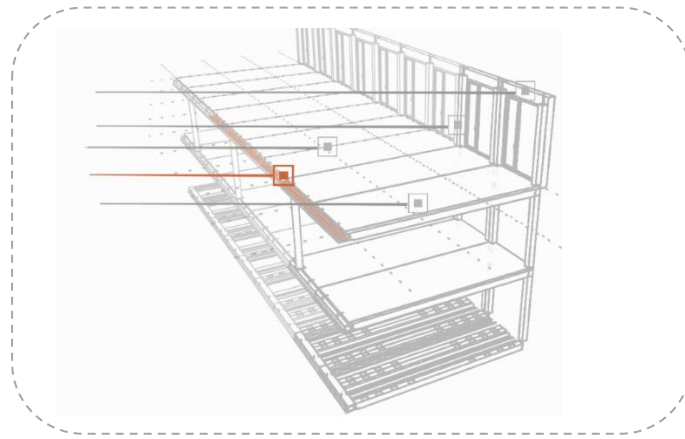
Steel girder at CREE system. (Sustainable building systems | timber hybrid office buildings - CREE Buildings)
